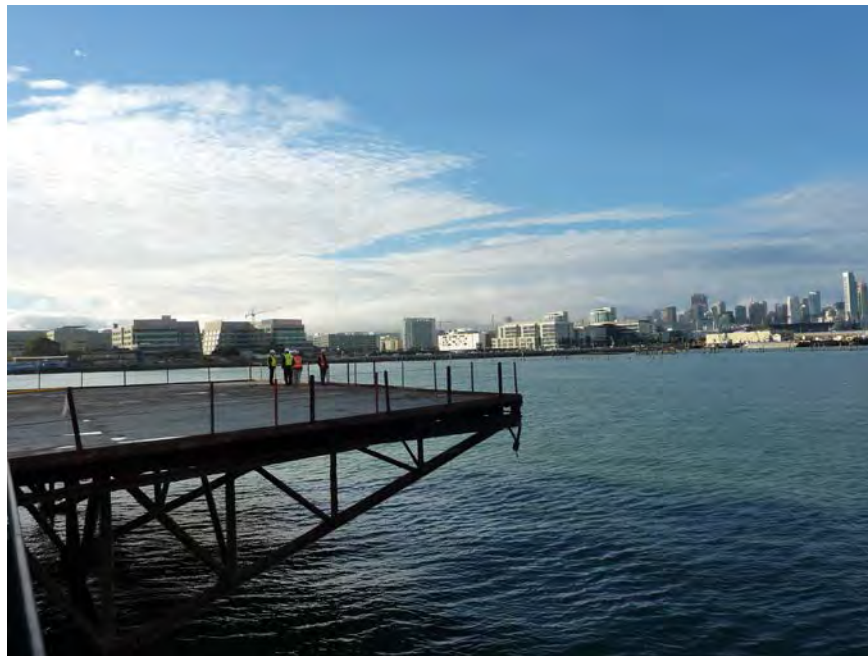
The approach to the Pier 70 Shipyard viewed from the edge of Drydock #2 looking out onto Central Basin. The areas between and directly in front of the piers and drydocks are deeper than most of Central Basin.
